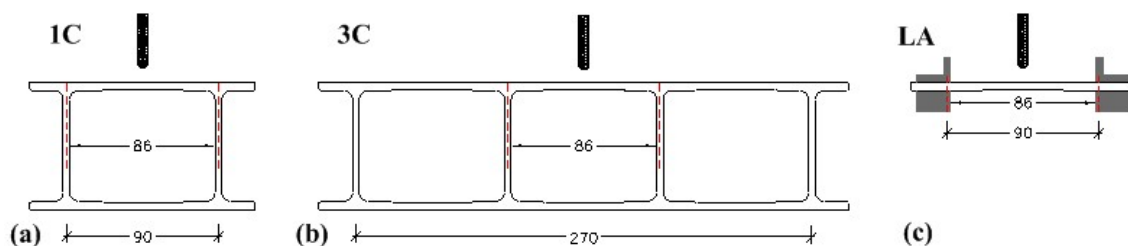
Specimen geometries: (a) 1-cell, (b) 3-cell and (c) clamped laminate (dimensions in mm).
